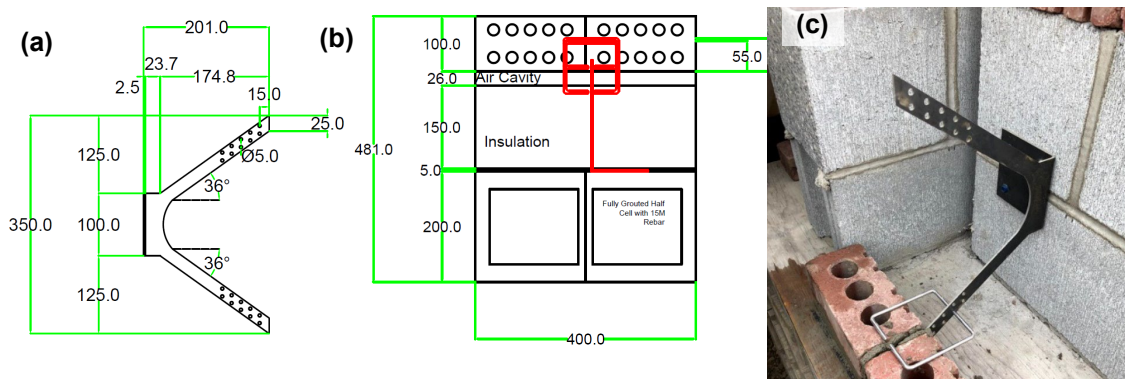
Inclined connector illustrations (a) inclined connector, (b) wall cross-section with upright connector, (c) wall specimen without brick veneer. All dimensions in mm.
